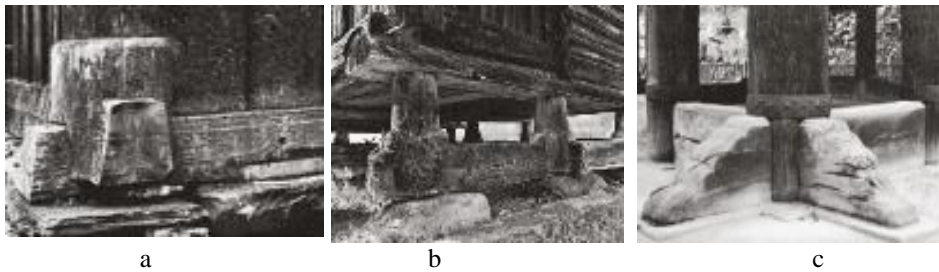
Full two-way neck joint (a) church in Bygdoy Norway (b) house in Gudbrandsgard Norway (c) bell tower in Kyoto Japan
